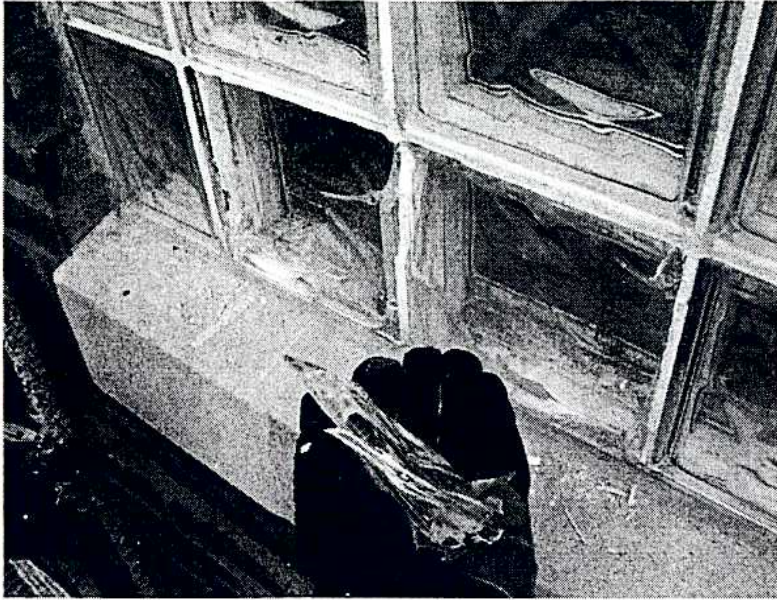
Broken glass blocks at the 6th floor of the west elevation.
